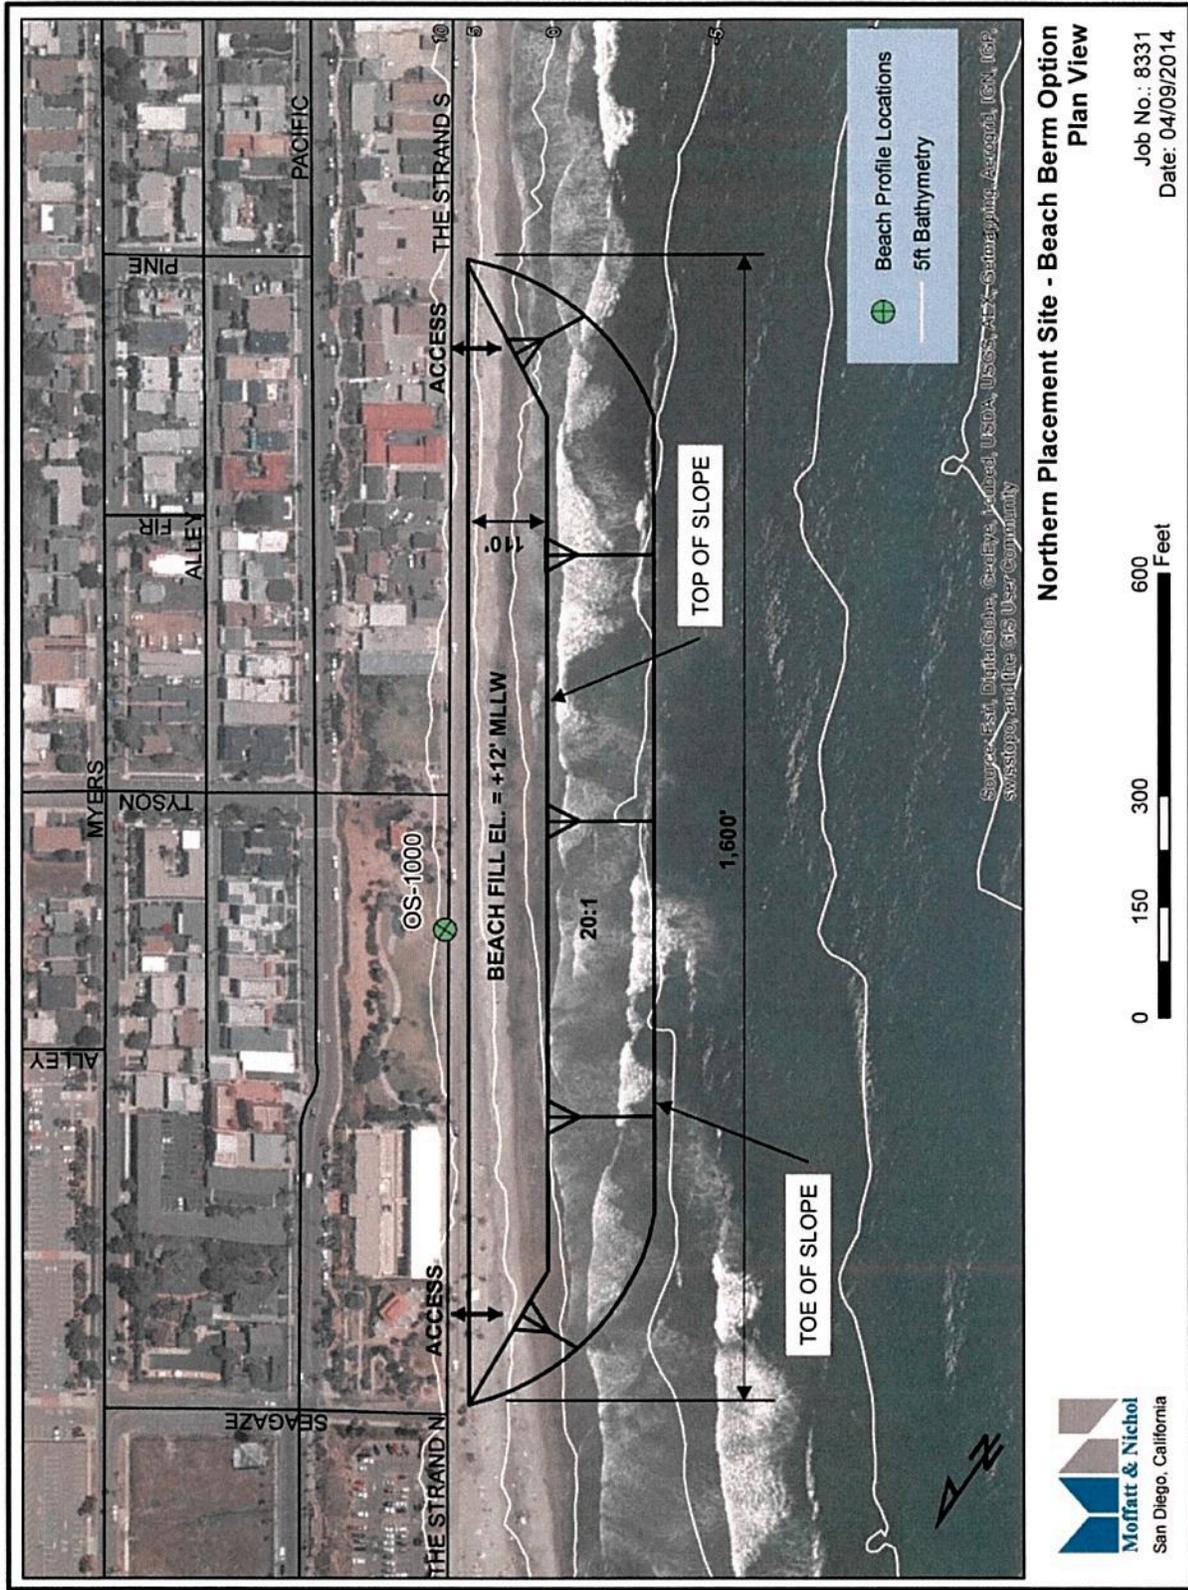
Northern Placement Site Beach Berm Option - Plan View
